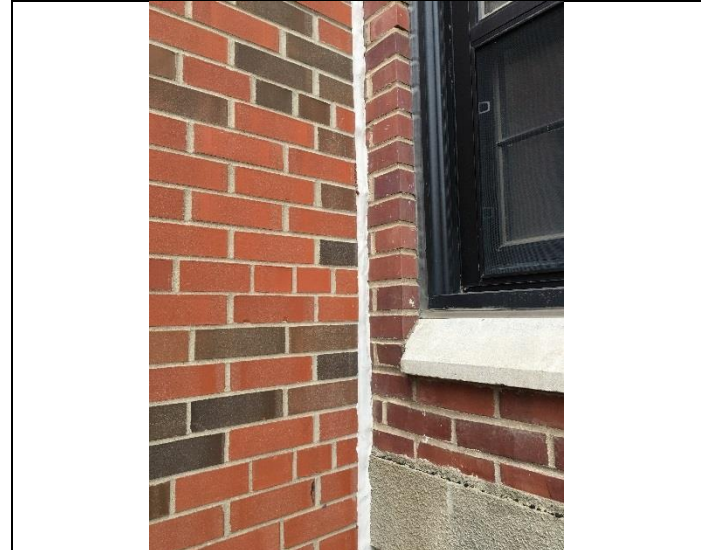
White Joint Caulk – Entry to Mech. Room
